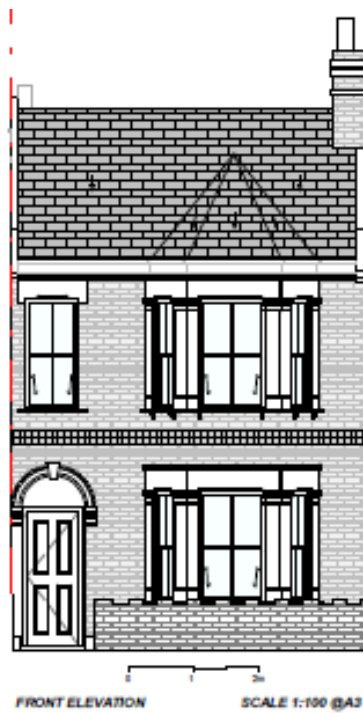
Existing and Proposed Front Elevation showing two (2) rooflights on front roof slope.
